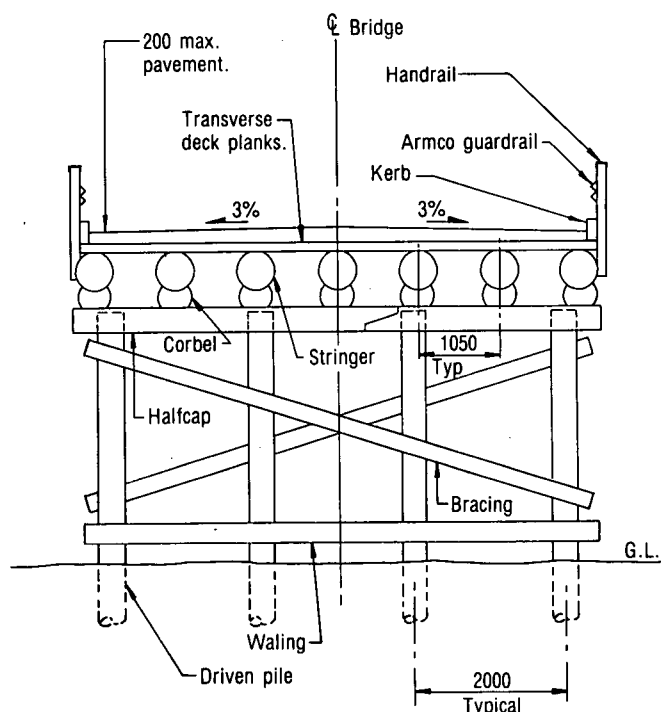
CROSS-SECTION OF STANDARD TIMBER BRIDGE
